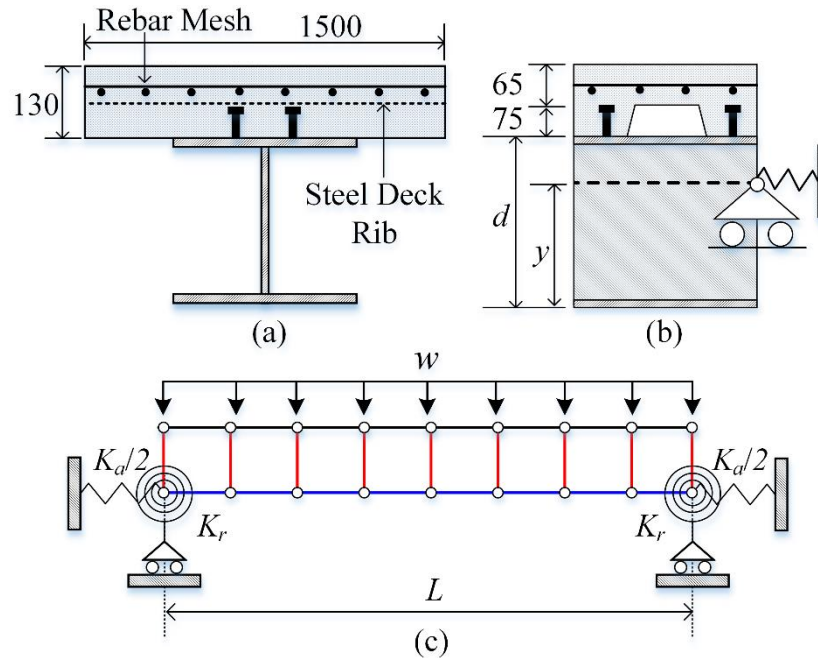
Test configuration of the composite beam examined: (a) cross-sectional dimensions; (b) profile view of the beam; (c) span, boundary conditions, and load configuration. All dimensions in [mm].
